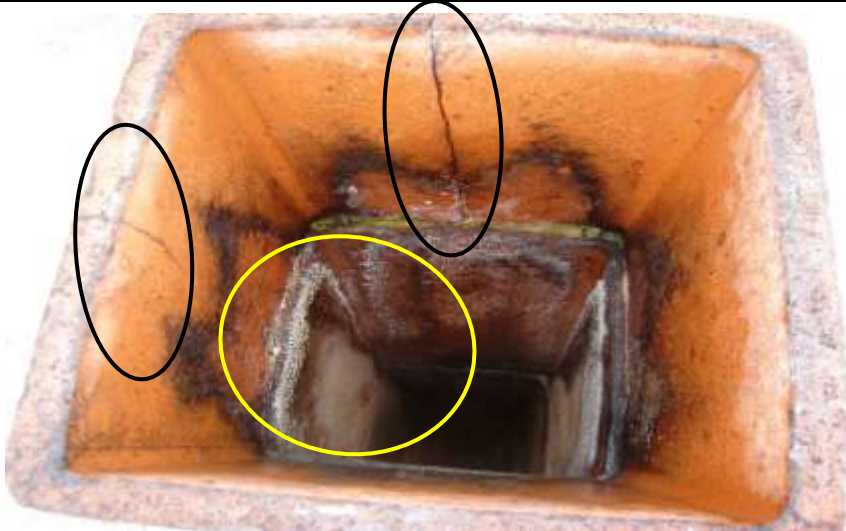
Cracks, efflorescence(water entry), discoloration and deterioration inside active flue for boiler.
